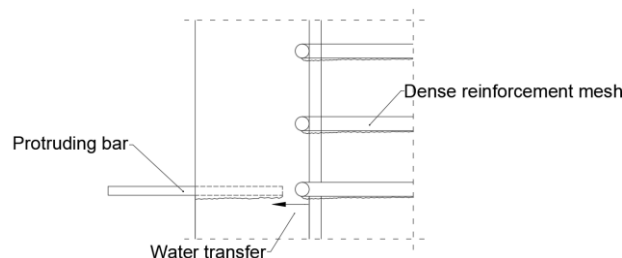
Permeating of water through sedimentation ducts under reinforcement.
